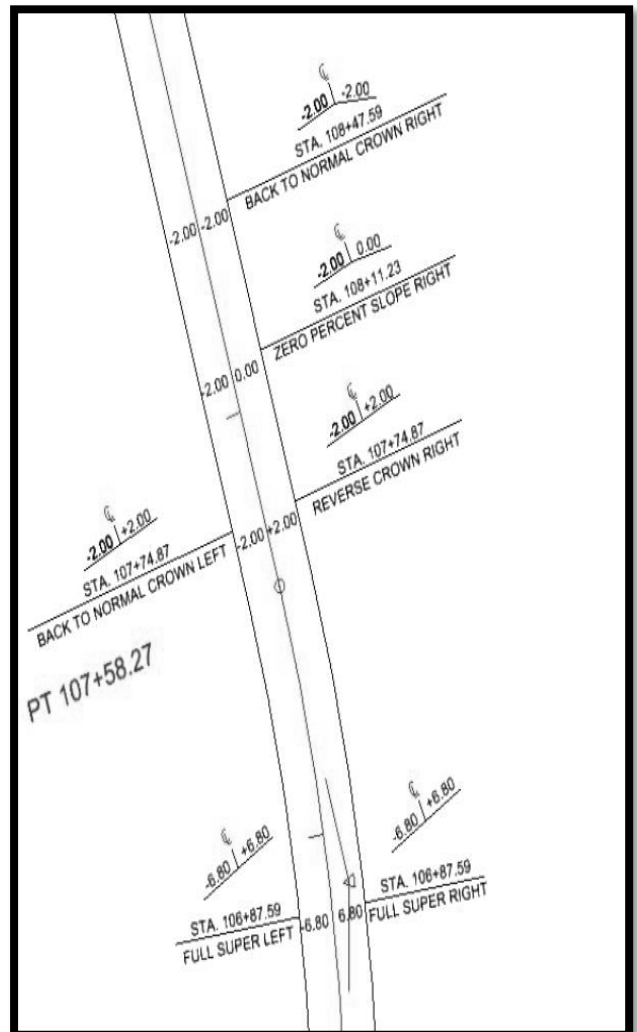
STATIONS AND CROSS SLOPES AFTER FULL SUPERELEVATION
